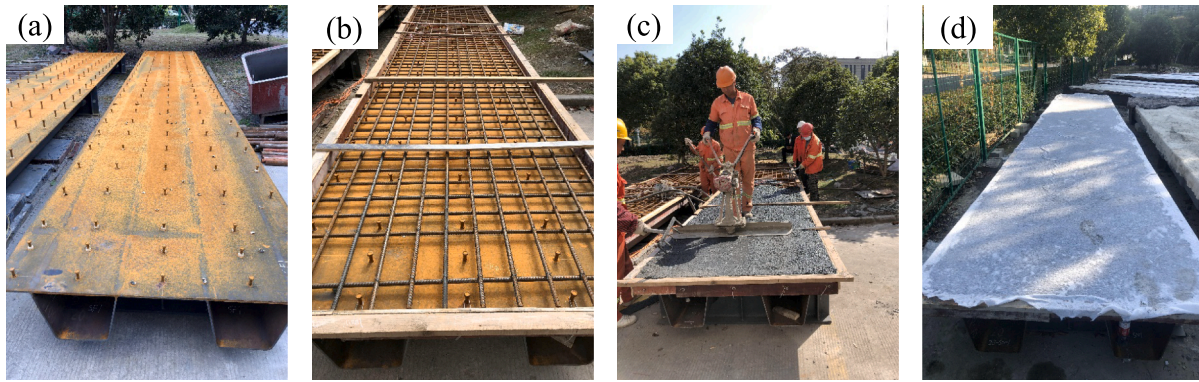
Specimen fabricating procedures: (a) making of OSD and studs; (b) arranging of rebar mesh and formwork; (c) casting of UHPC layer; (d) curing of UHPC layer.
